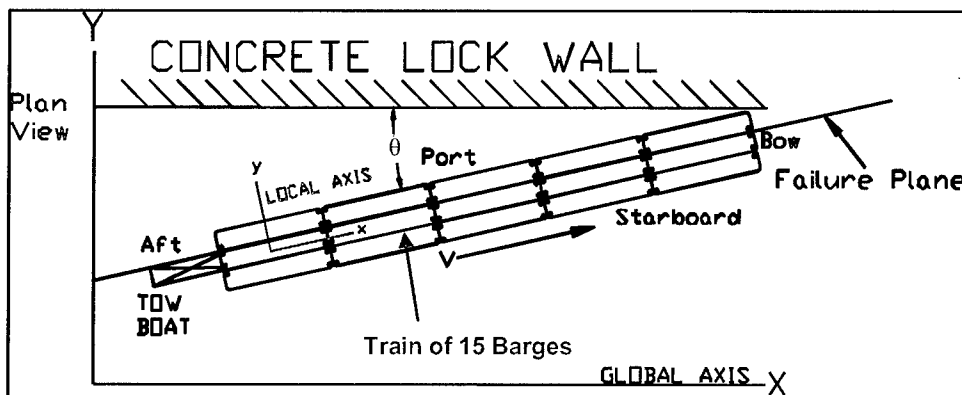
Longitudinal failure mechanism: Lashing fails along a longitudinal failure plane between barges
